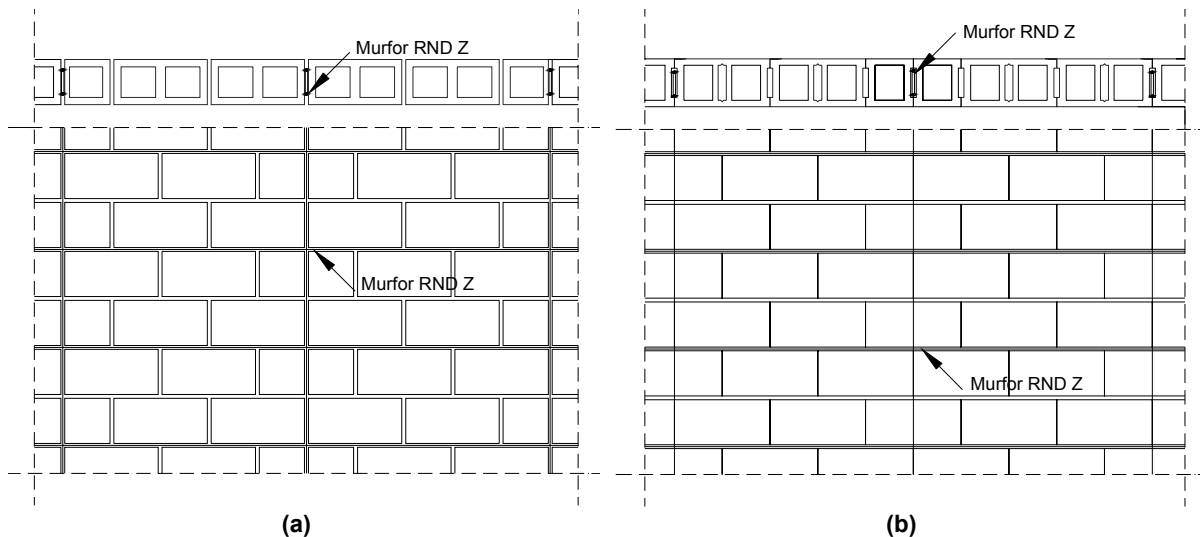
Construction systems based on the use of concrete units; (a) two hollow cell concrete units; (b) three hollow cell concrete units
